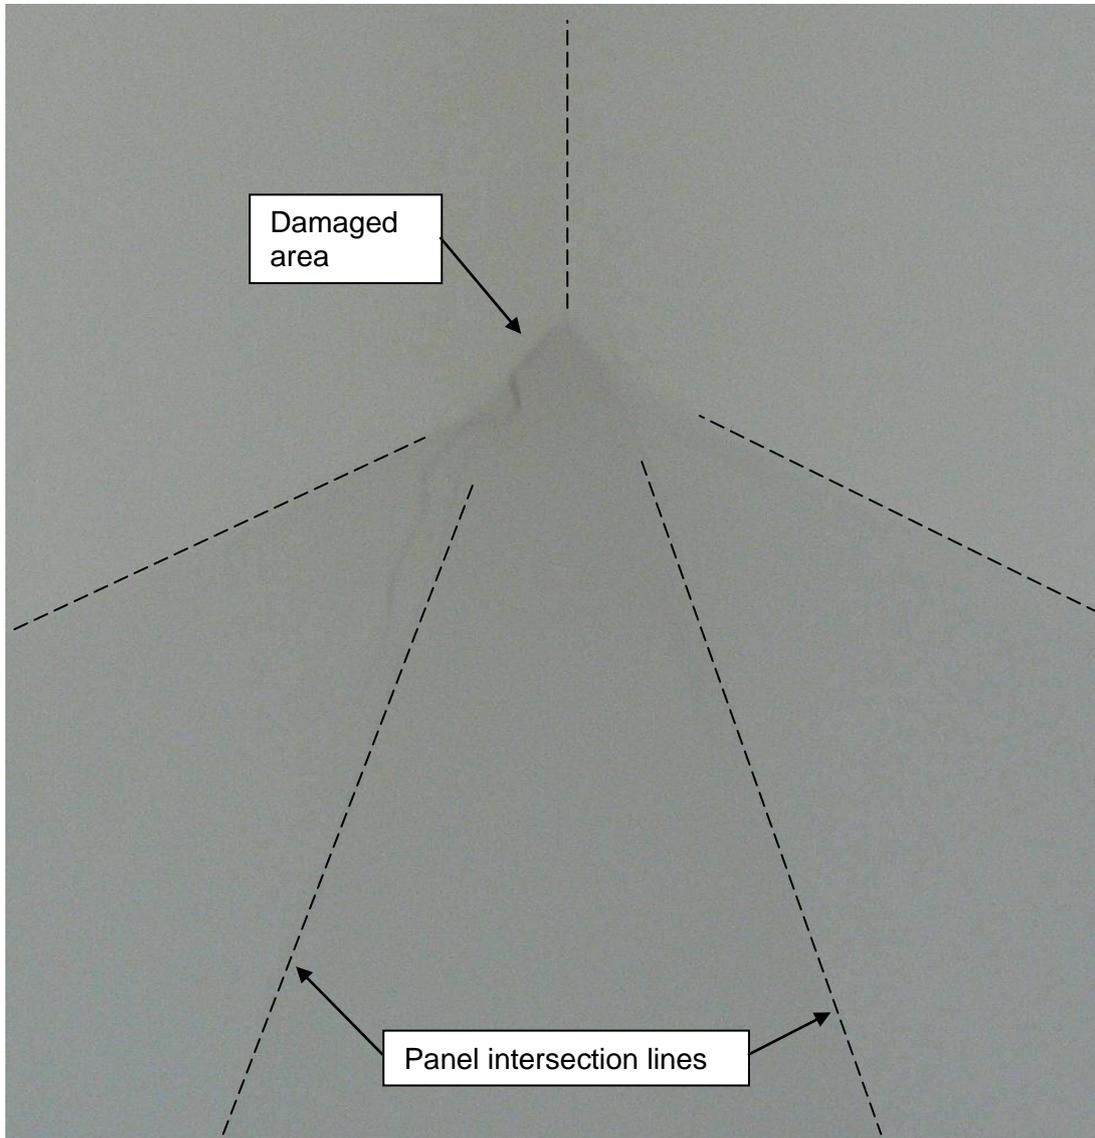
Cracking damage at the apex of a ceiling where the lining intersects at several angles
